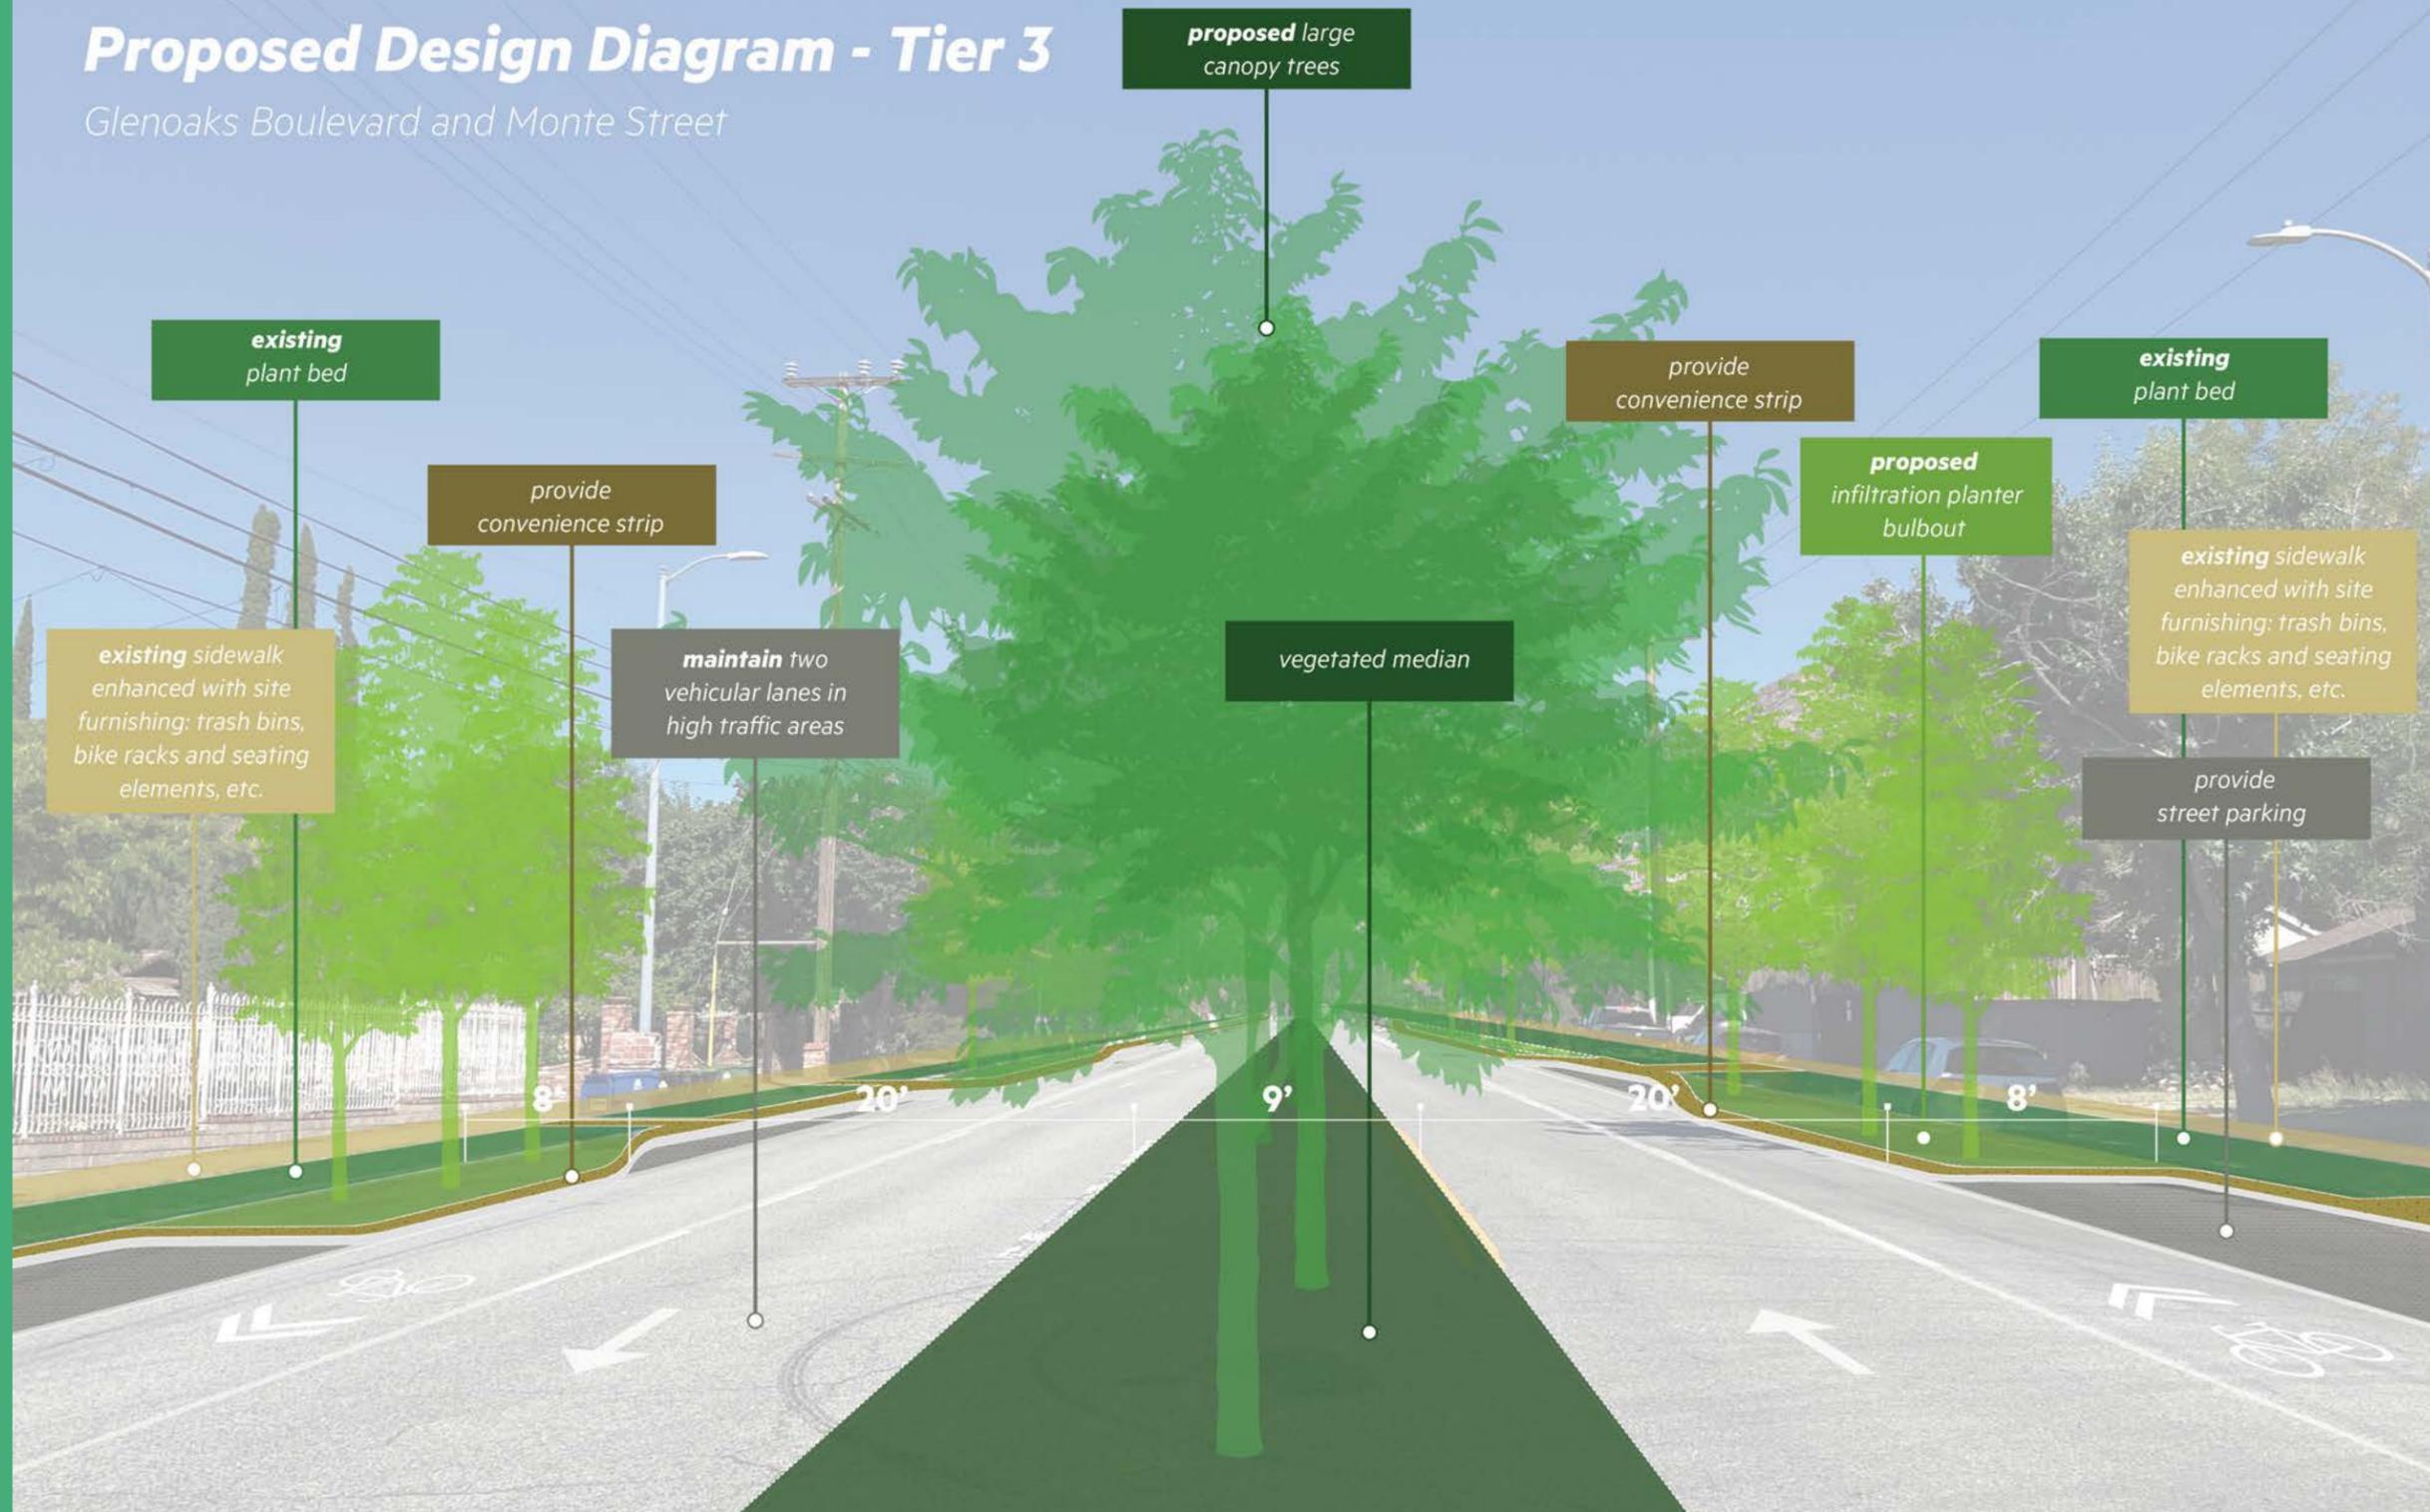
Glenoaks Boulevard and Monte Street, proposed design diagram, Tier 3
